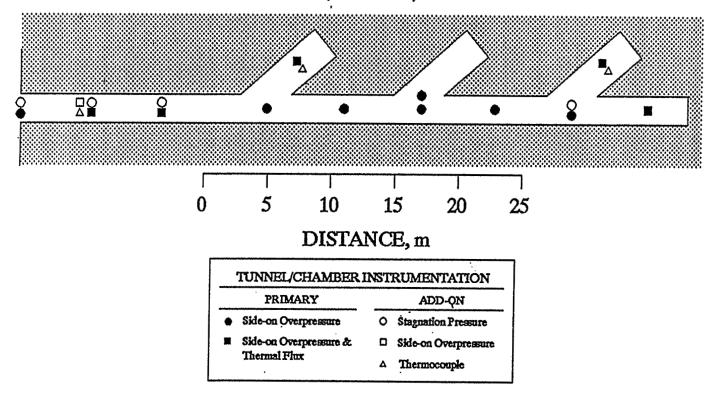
Interior transducer locations for 1/3-Scale Camp Stanley Underground Munitions Storage Concept Validation Test.
